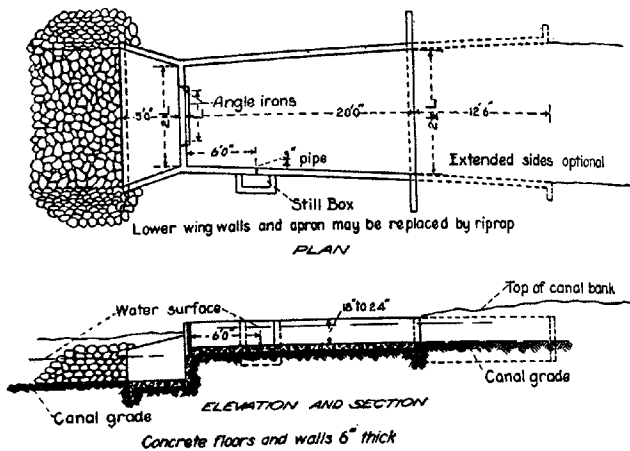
Plan, elevation, and section (standard) of new irrigation weir box.
